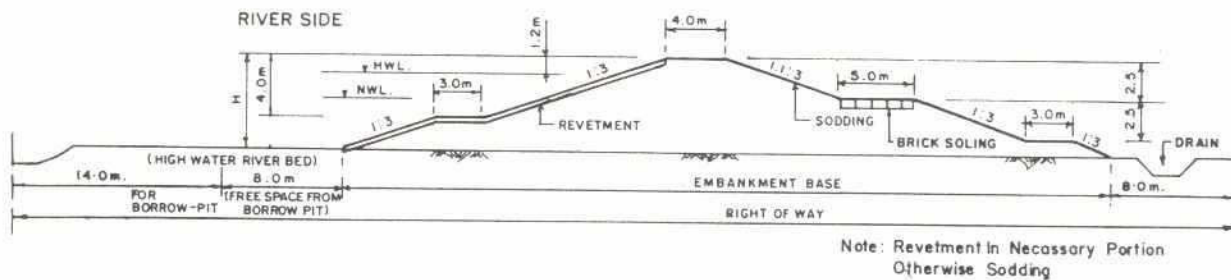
(1) STANDARD CROSS SECTION OF EMBANKMENT : GREATER DHAKA EAST
